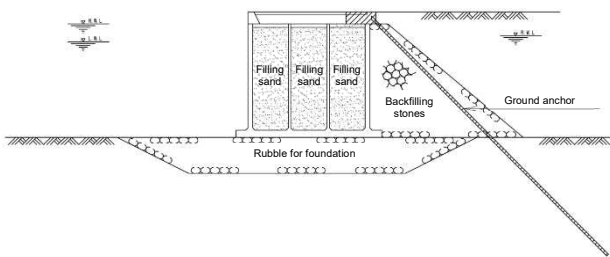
Example of a construction method for supporting a caisson (G-16)
